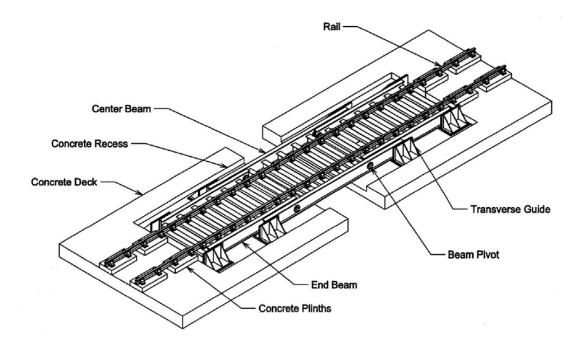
Expansion Joint Model – Span Connection Area – Dimensions in Feet and Inches.
